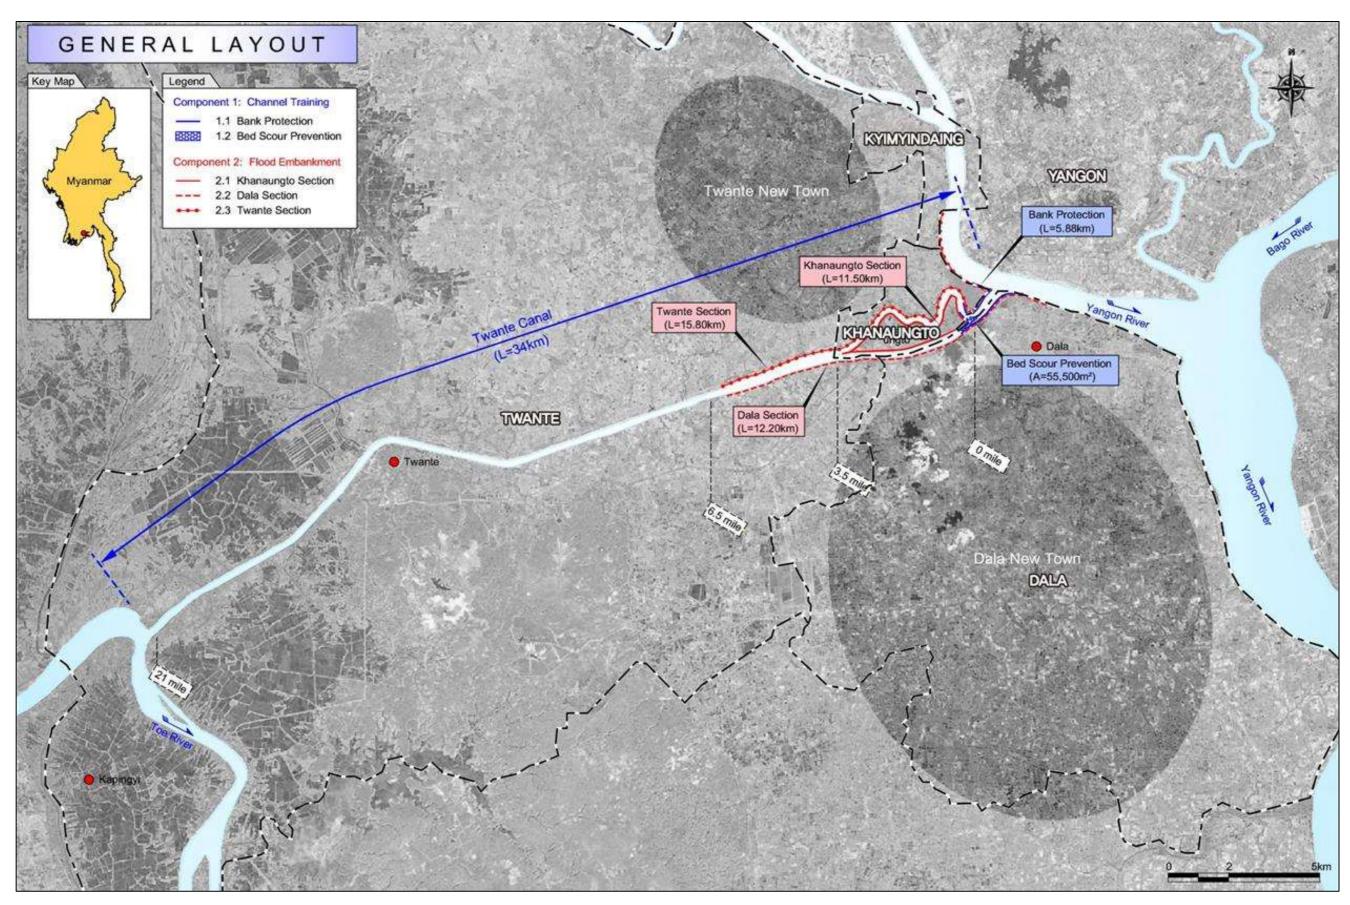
General Layout Plan of Twante (Twantay) Canal
